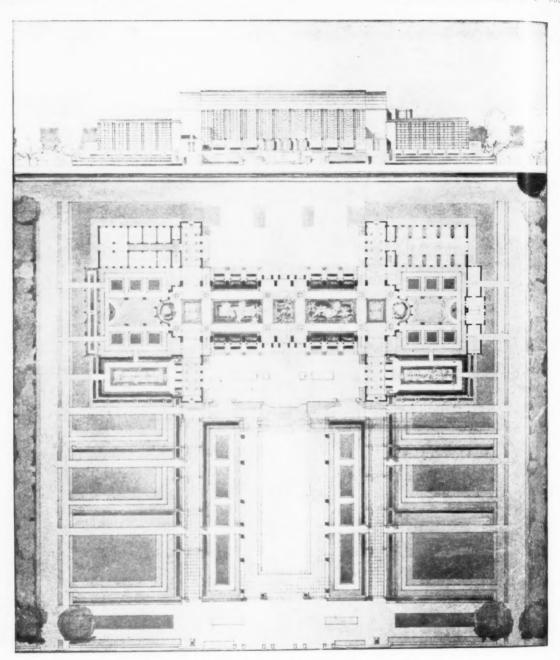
The Buildings and Lay-out of a Botanical Garden The Design by "Concrete"
